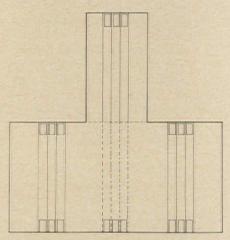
Separate banks of express and local elevators improve service for high-rise apartment buildings. One 34-story building has an express bank in the tower section, while local banks in the wings serve the lower floors
